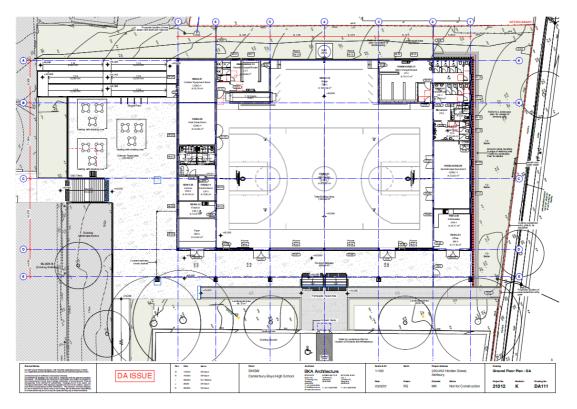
Ground Floor Plan (Source: BKA Architecture)
